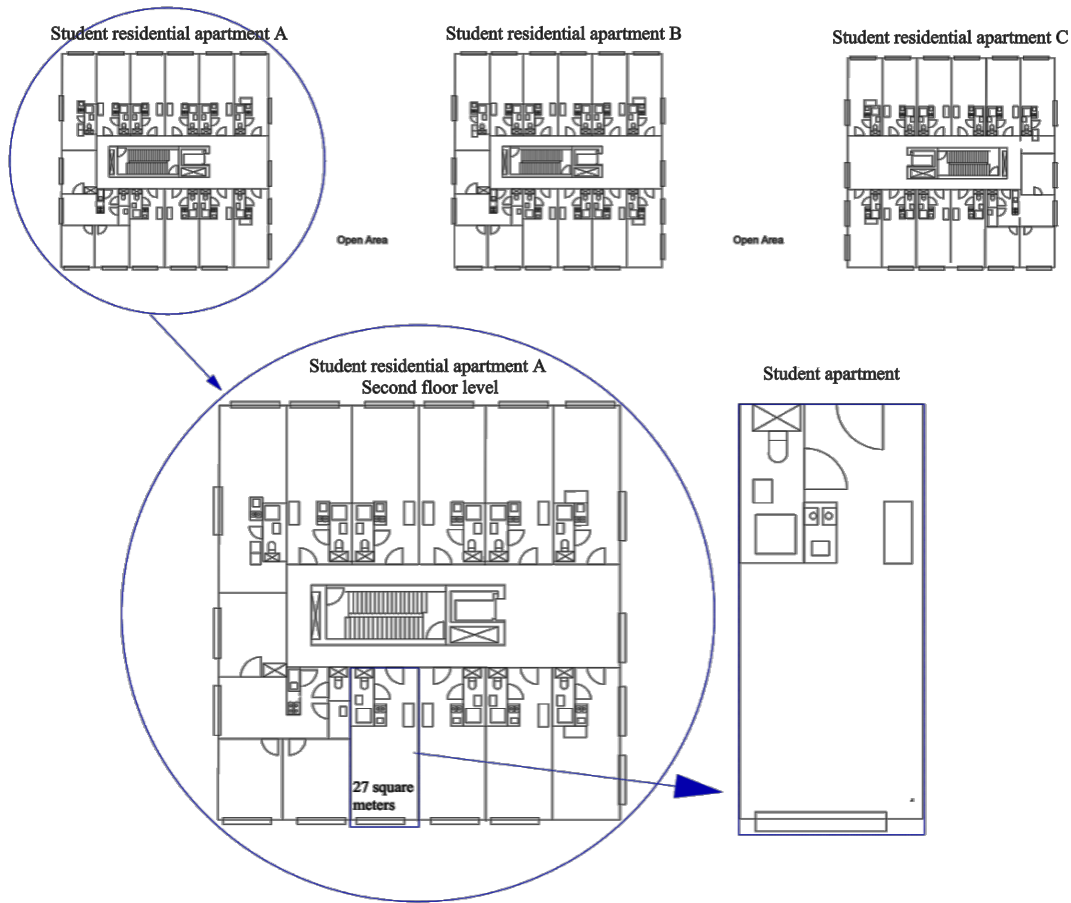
Sample floor plans of the student residential apartment and a single apartment (Source: authors)
